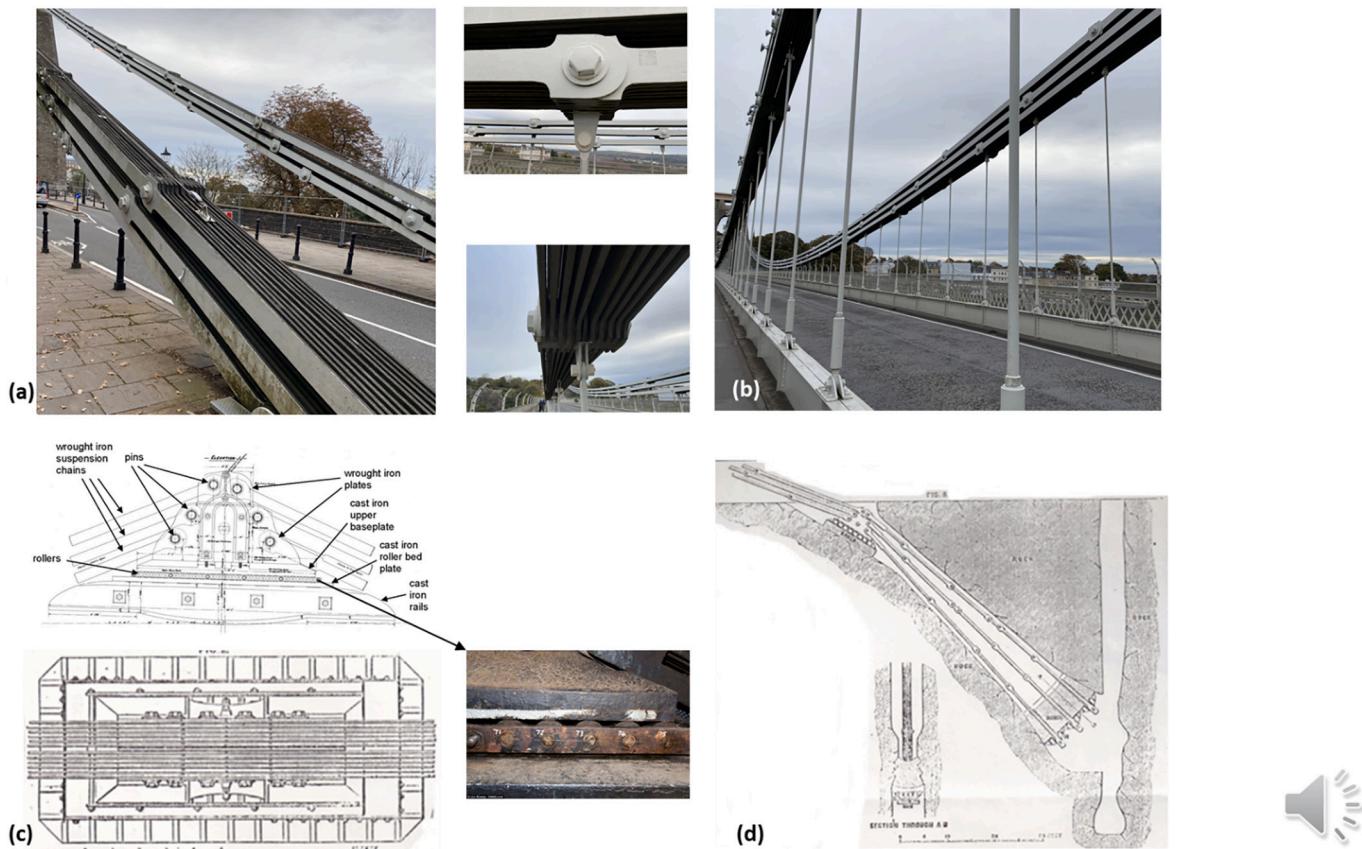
Details of the suspension system of the Clifton Suspension Bridge: (a) suspension chains; (b) suspension rods; (c) rolling tower saddles (reproduced with permission; Copyright © Clifton Suspension Bridge Trust, see also archives.cliftonbridge.org.uk); (d) land saddles and anchors (reproduced with permission; Copyright © Clifton Suspension Bridge Trust, see also archives.cliftonbridge.org.uk).
